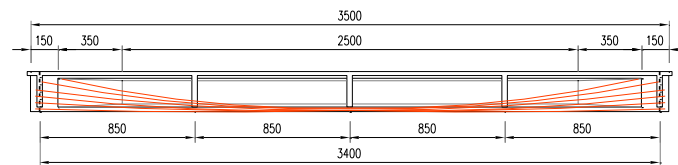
Longitudinal view of the main girder with cables trend / Prospetto longitudinale della trave principale con andamento dei cavi.
